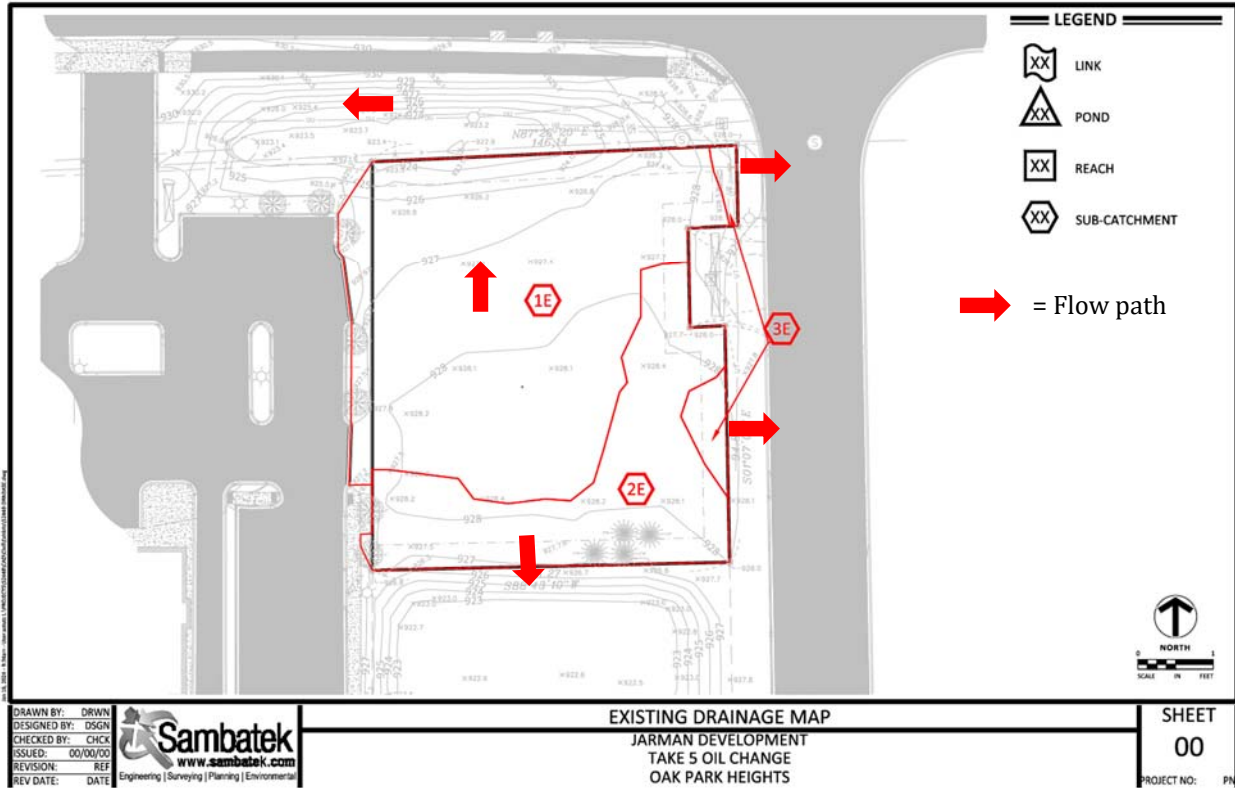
Existing site drainage for Outlot A (Take 5 Oil Change).
